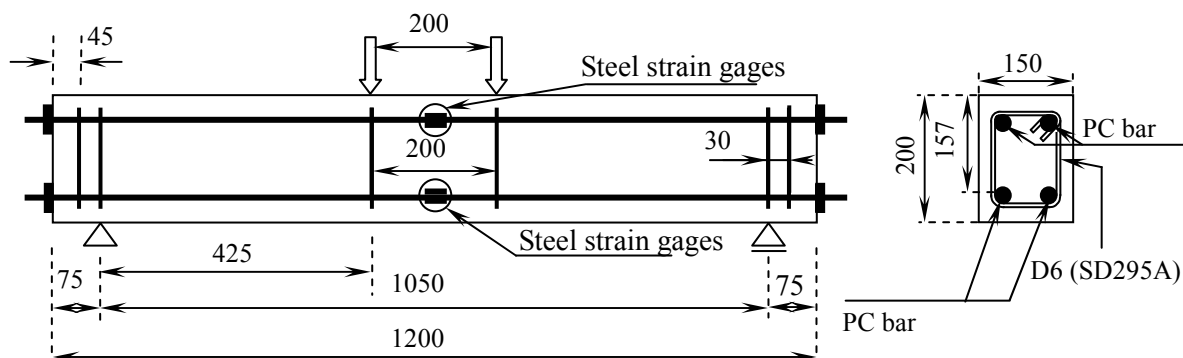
Beam sizes and reinforcement layout (unit: mm)
